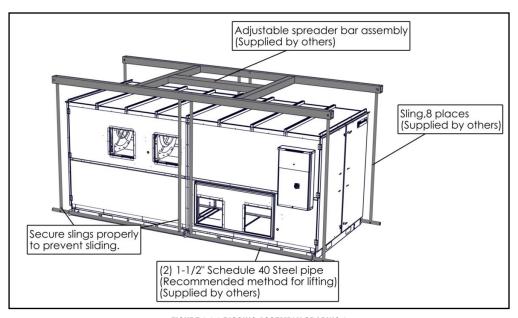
RIGGING ASSEMBLY GRAPHIC 1
